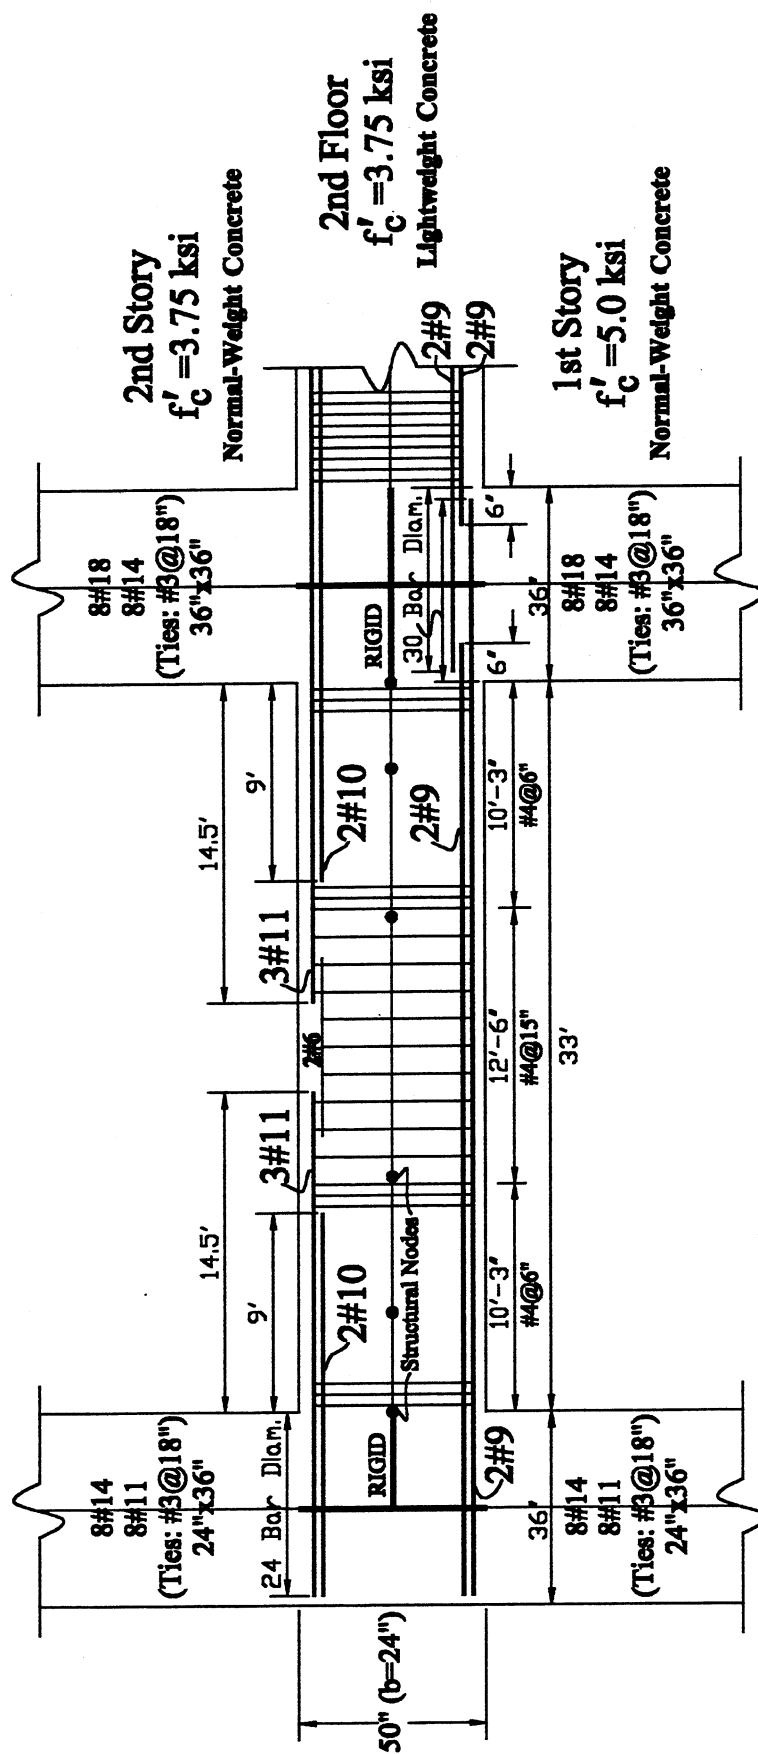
Reinforcement details for the 2<sup>nd</sup> floor beams of interior transverse frames.
